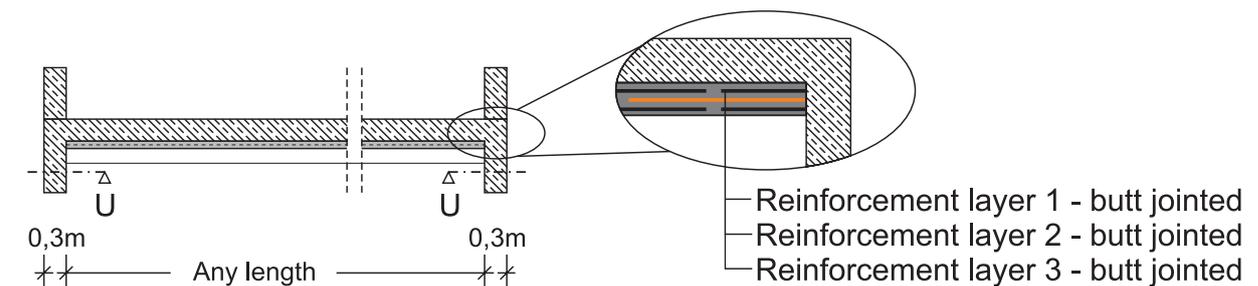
Section B-B of proposed strengthening with detailed edge connection (see also figure 4.8)
